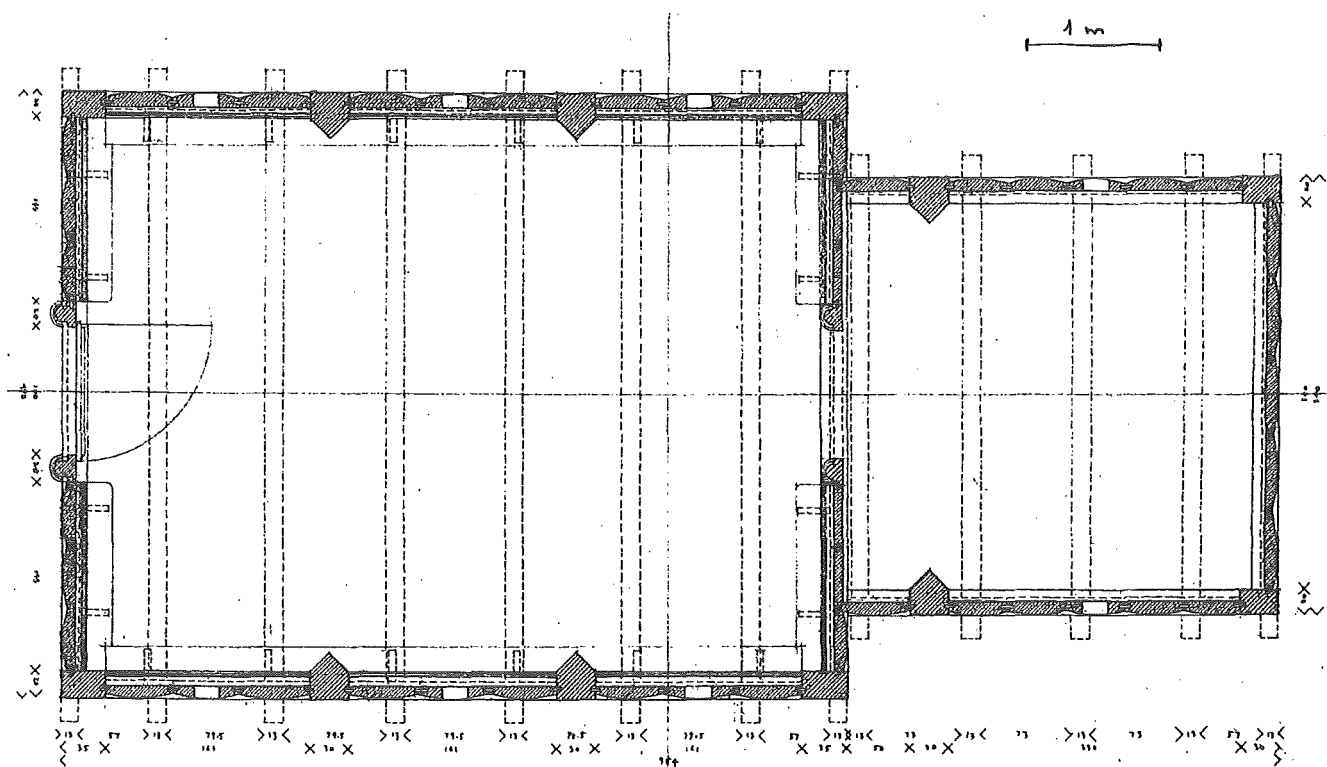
Suggested reconstruction of the Hørning stave church: plan, by Holger Schmidt 1994-96. Narrow wall benches have been built on the northern, southern and western sides of the nave. The chancel has a simple timber altar (traces of such features were not found during excavation but the church could hardly be built without wall benches or altar).
